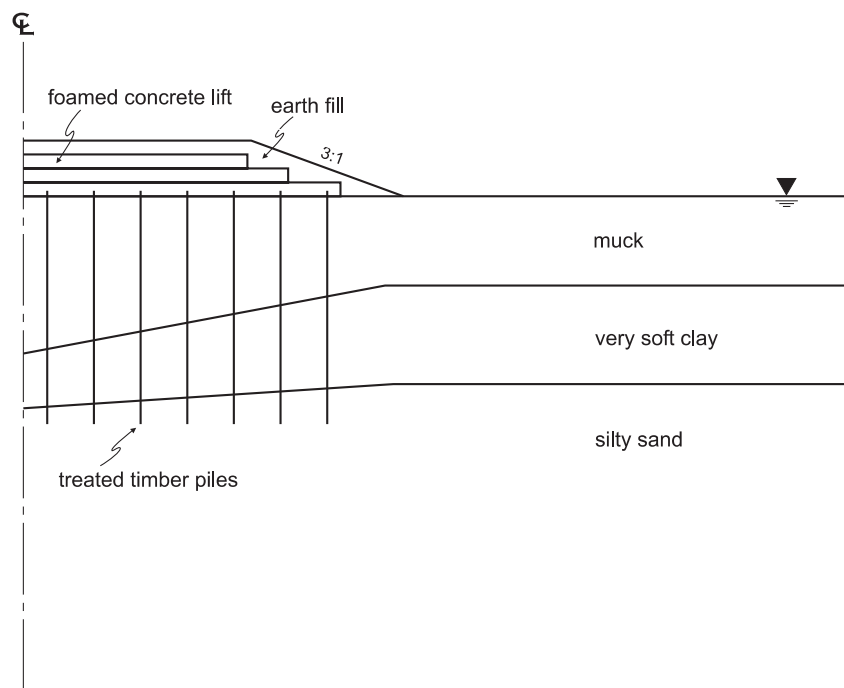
Half-section view of foamed concrete embankment on timber piles
